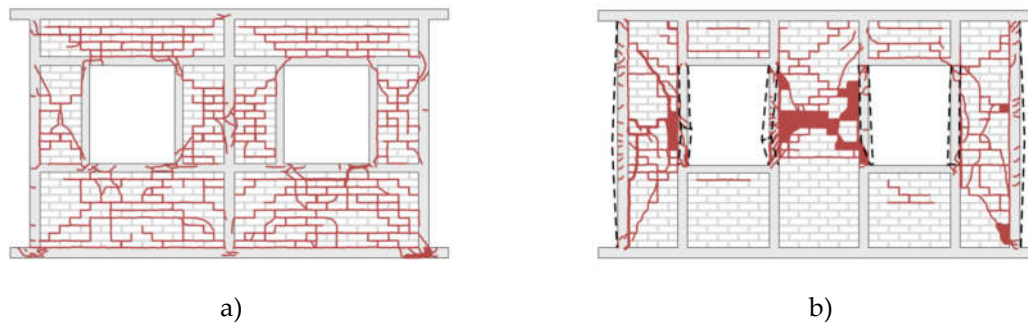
Damage of CM wall specimens with openings [118]: (a) continuous horizontal RC sill and lintel band and discontinuous vertical confining elements and (b) continuous tie-columns and discontinuous horizontal confining elements.
